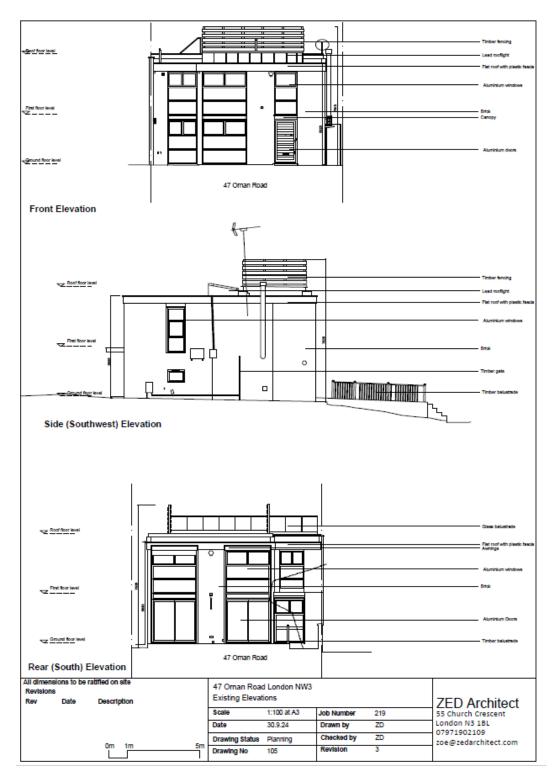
Existing front, side and rear elevation (Source: submitted drawings)
